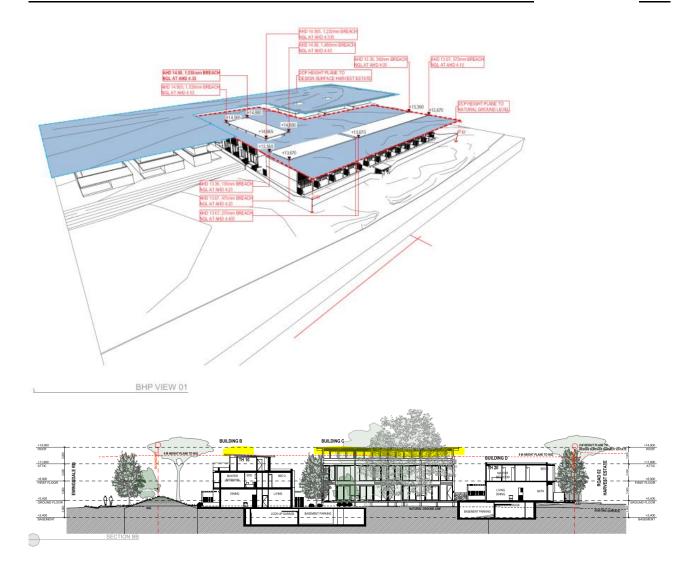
3D of building height extent and cross section showing areas of building exceeding height limit (highlighted yellow). See attached plans to report for more detail.
